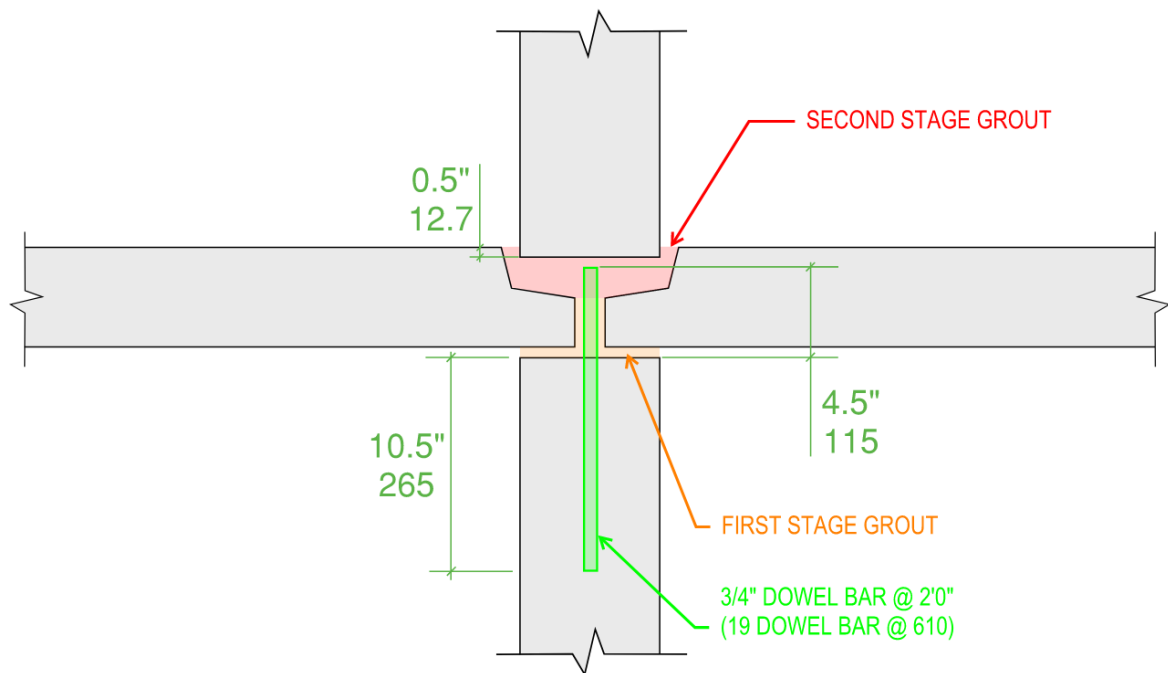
Typical load-bearing wall Panel to slab panel connection detail (dowel terminates within slab depth). This detail occurs in the majority of the wall panels.
